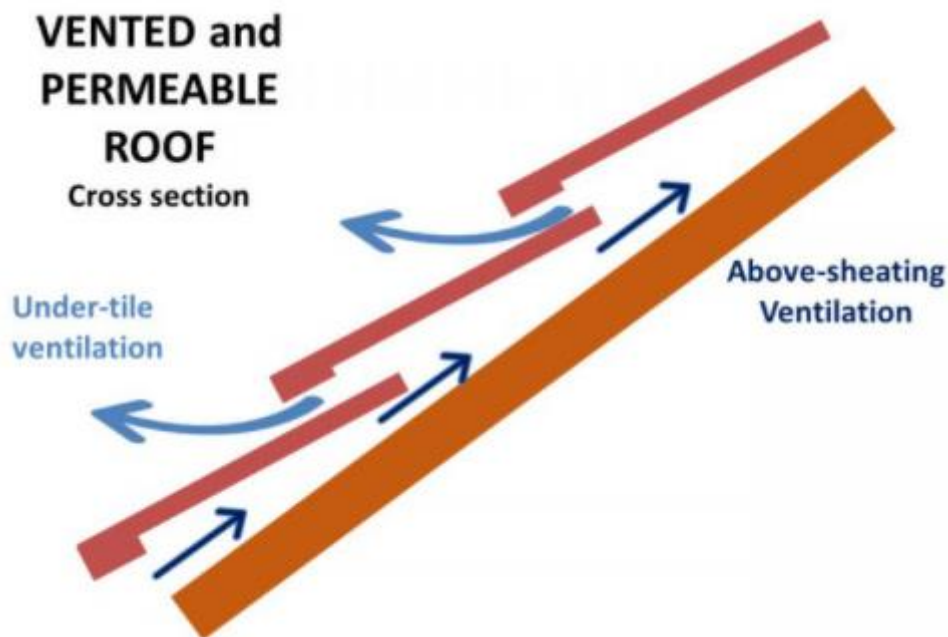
Ventilated and Permeable Roof cross section (Superhero, n.d.).
